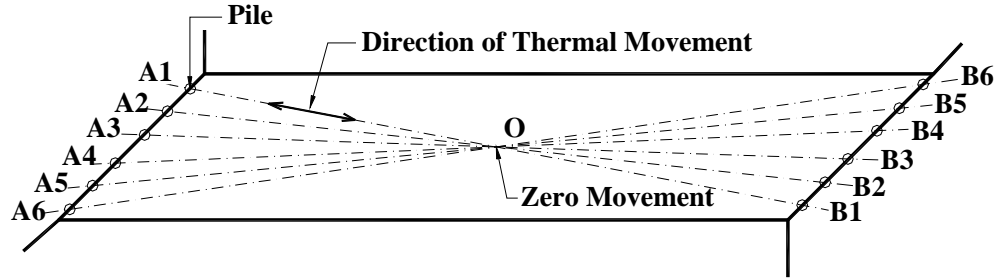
Thermal Movement of Skewed Bridge without Backfill Soil Pressure
